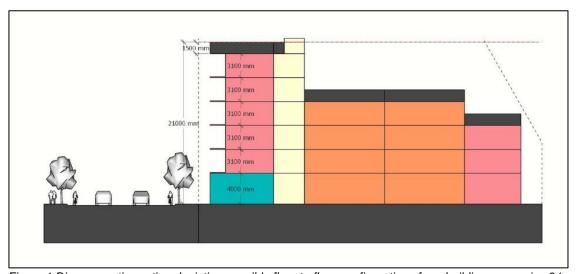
Diagrammatic section depicting possible floor to floor configurations for a building measuring 21m in height
